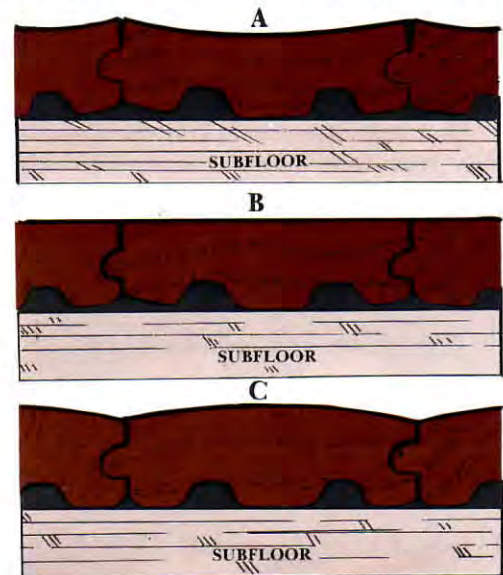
Cupped floors -- end view. A -- concave face, convex back; B -- same position after surface has been sanded flat; C -- boards have reverted to original shape, but face edges recede, producing a convex surface.
